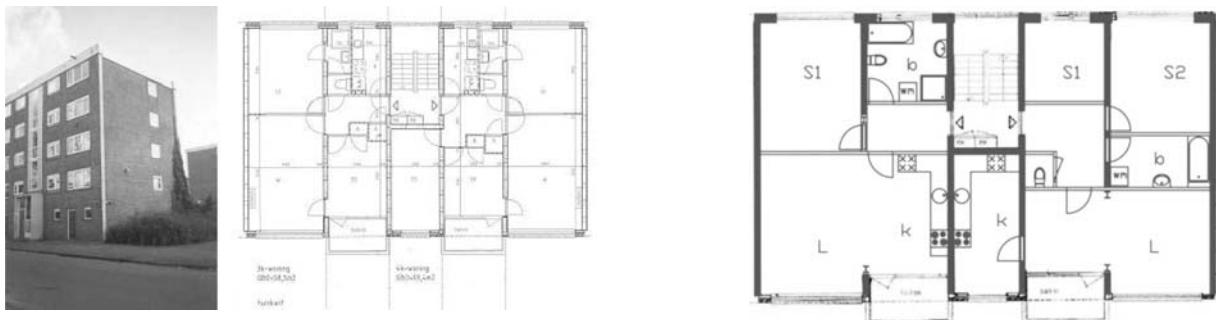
Existing floor plan (left); Alternative floor plan that shows that removing only one part of the bearing wall (right).
